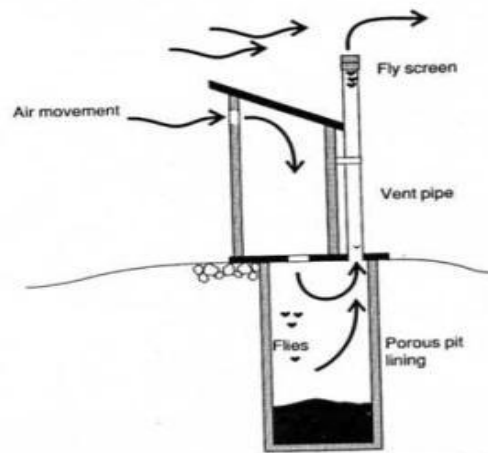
Ventilated improved pit (VIP) latrine (cross sectional view)
